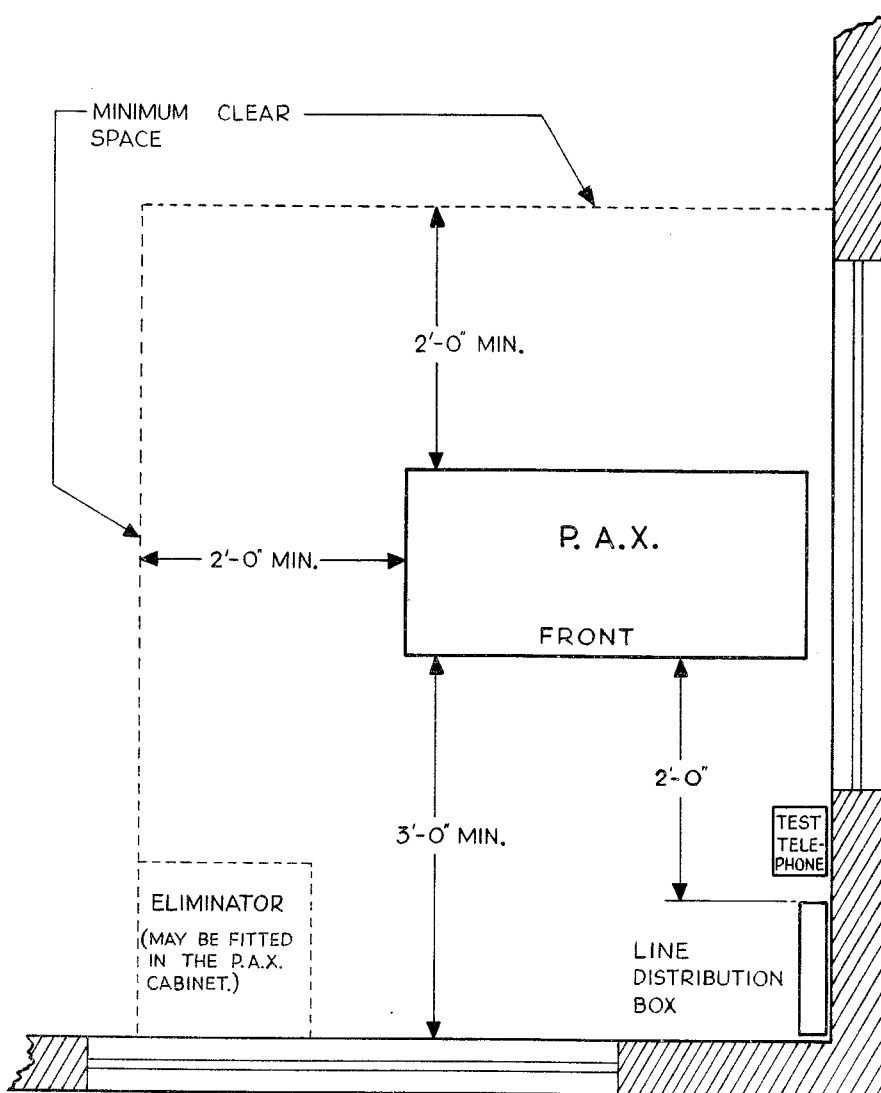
TYPICAL EXCHANGE ROOM LAYOUT
